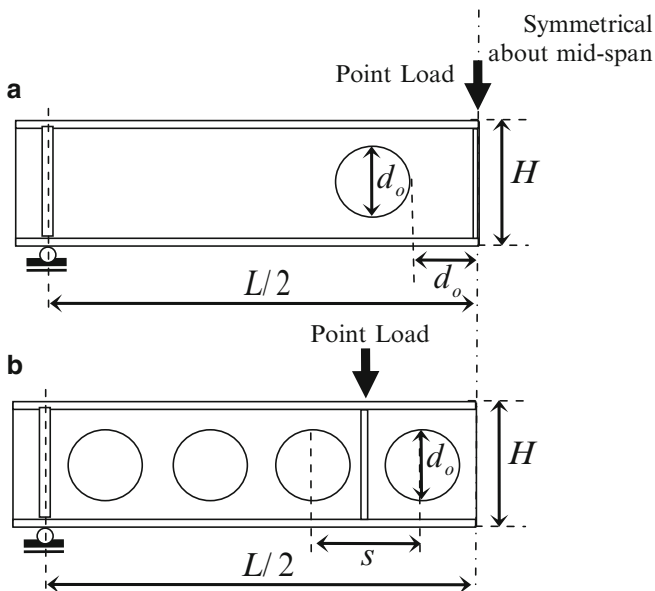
Model for evaluating Vierendeel failure: (a) steel beam with a single opening and (b) cellular beams
